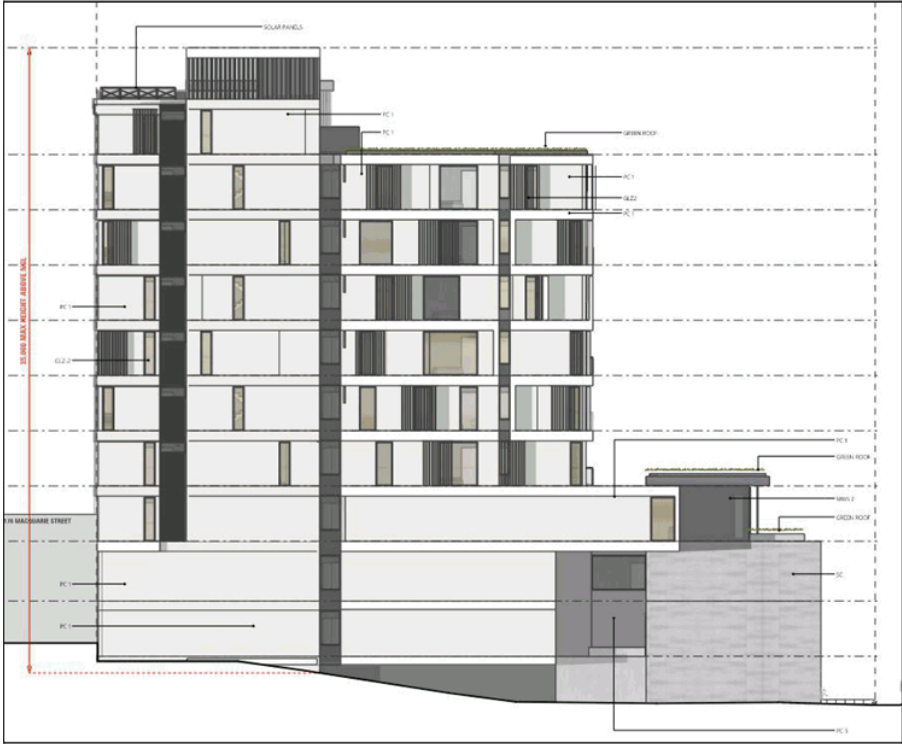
South-western (side) elevation of the proposed building (Source: Irenelnc/JAWS).
